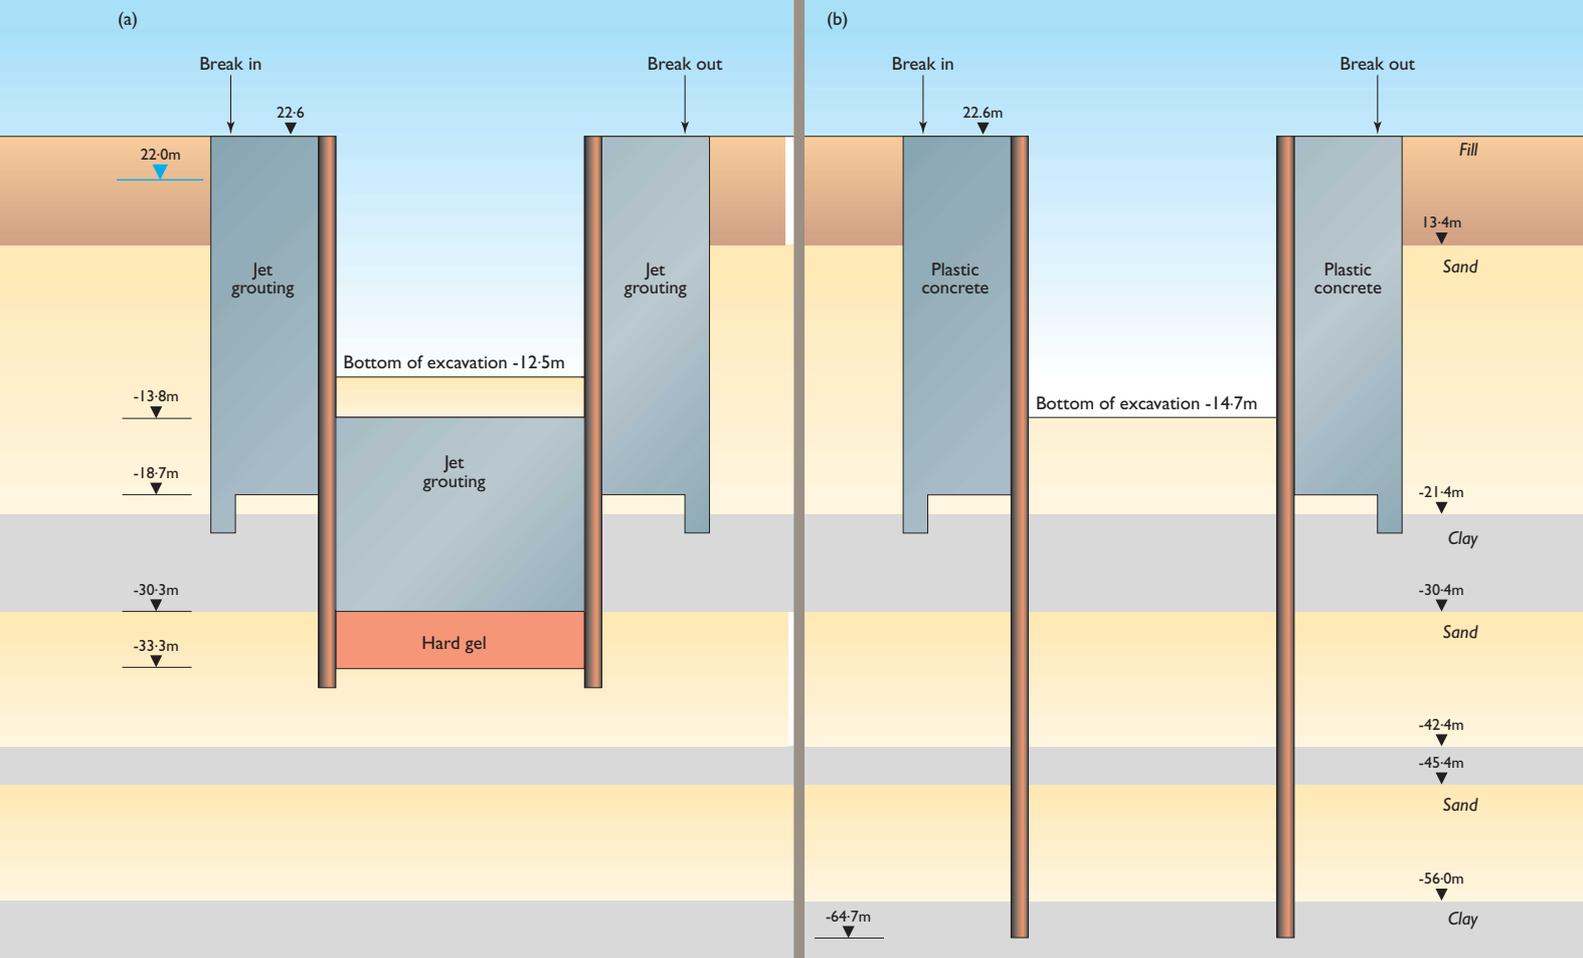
Original plan for resisting groundwater uplift on ventilation stations involved installing a jet-grouted gel plug between the diaphragm wall (a); whereas the contractor opted to extend the walls down to a watertight clay layer up to 87 m below the surface (b)
